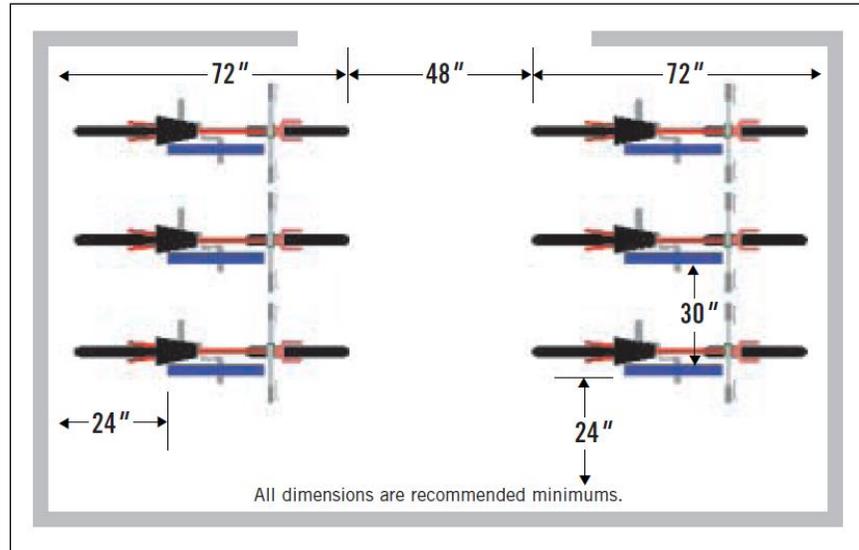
(d)(1)c. Bicycle Parking Layout.
